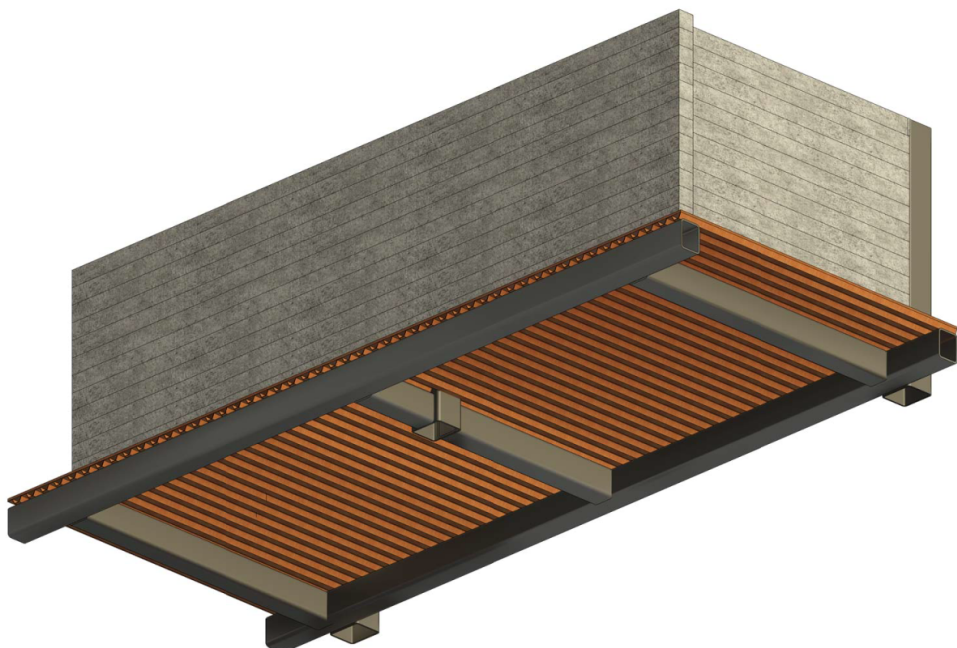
A 3D view of three locations where the steel frame connects to the 3D printed bridge
